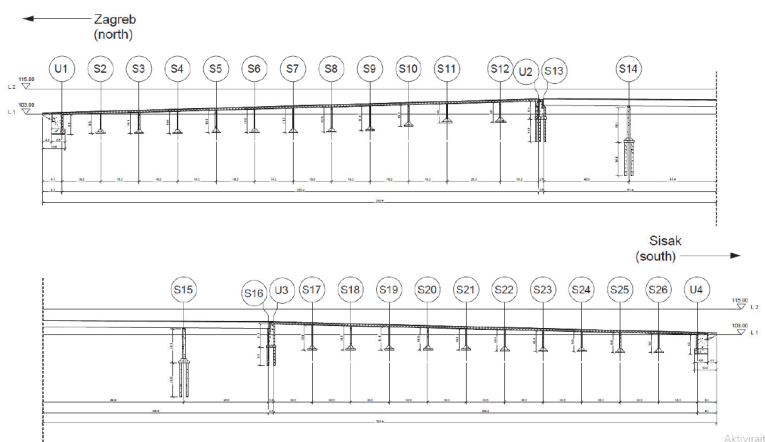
Overview of the Gromovi Bridge with labelled structural elements [2]
